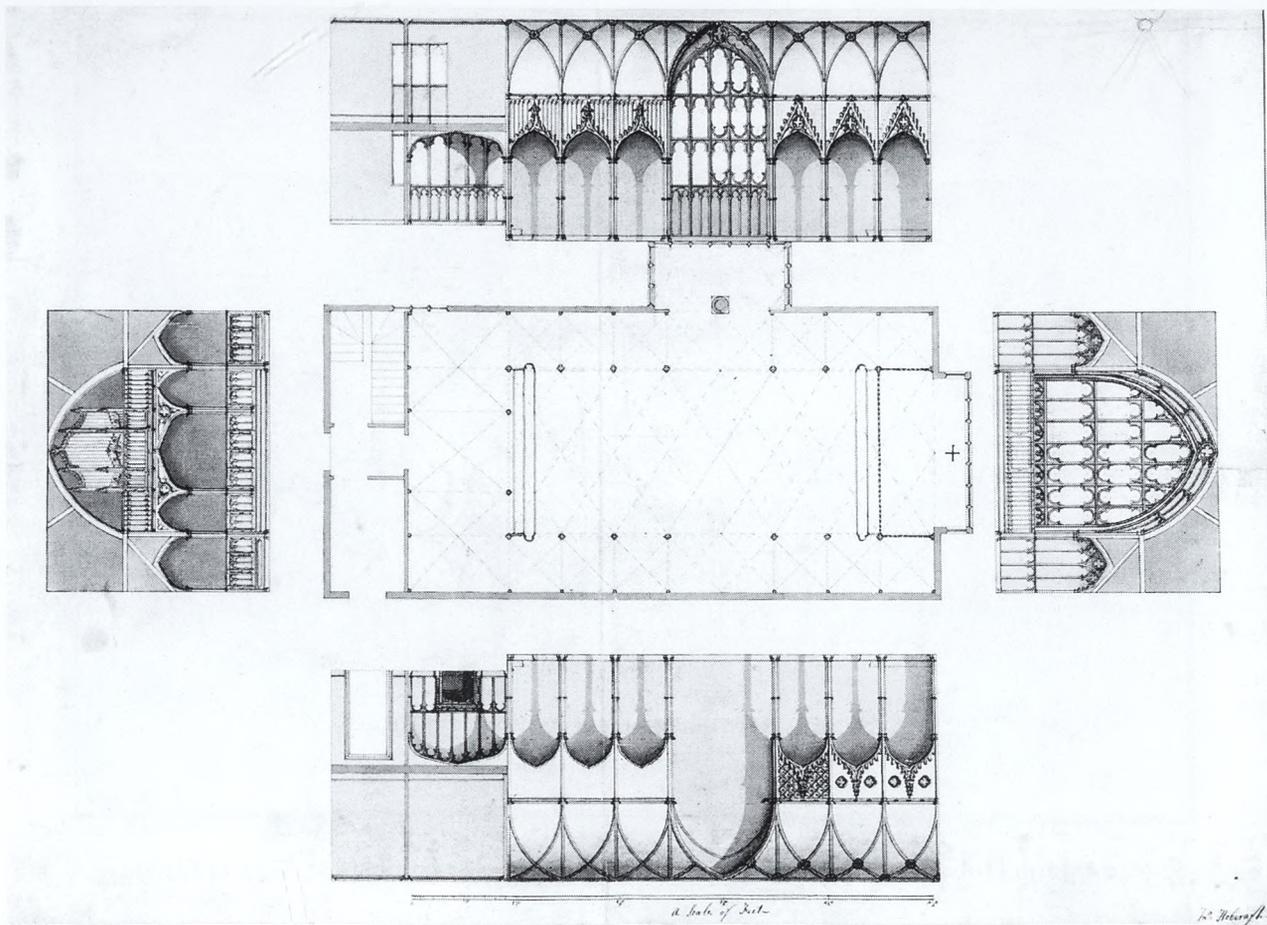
John Hobcroft, plan and internal elevations of proposed chapel, Audley End House.
